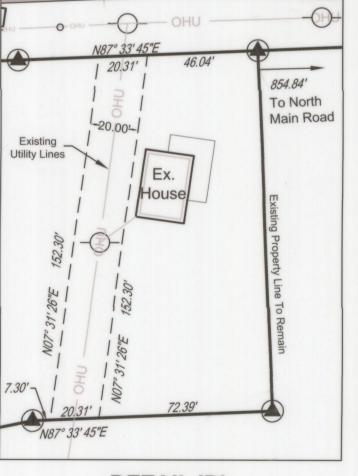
DETAIL 'B' PROPOSED LOT 302 CONFIGURATION 1" = 100'
